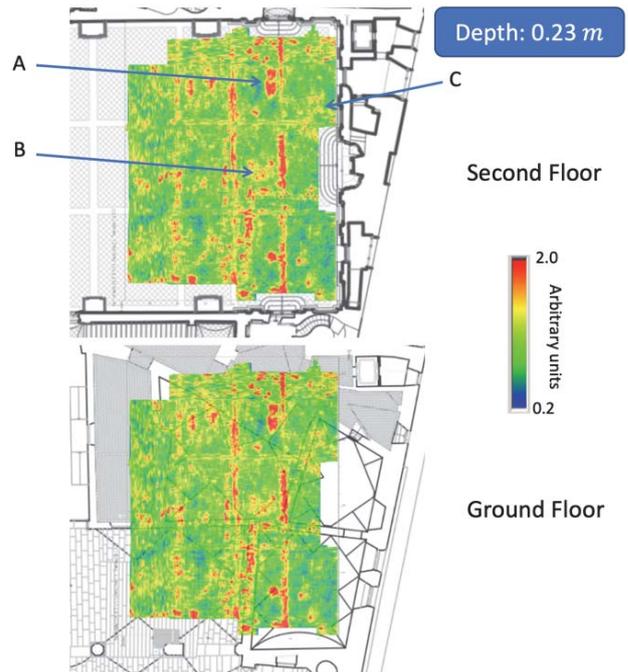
C-scan at 0.23 m superimposed to the maps of the second floor and the ground floor
